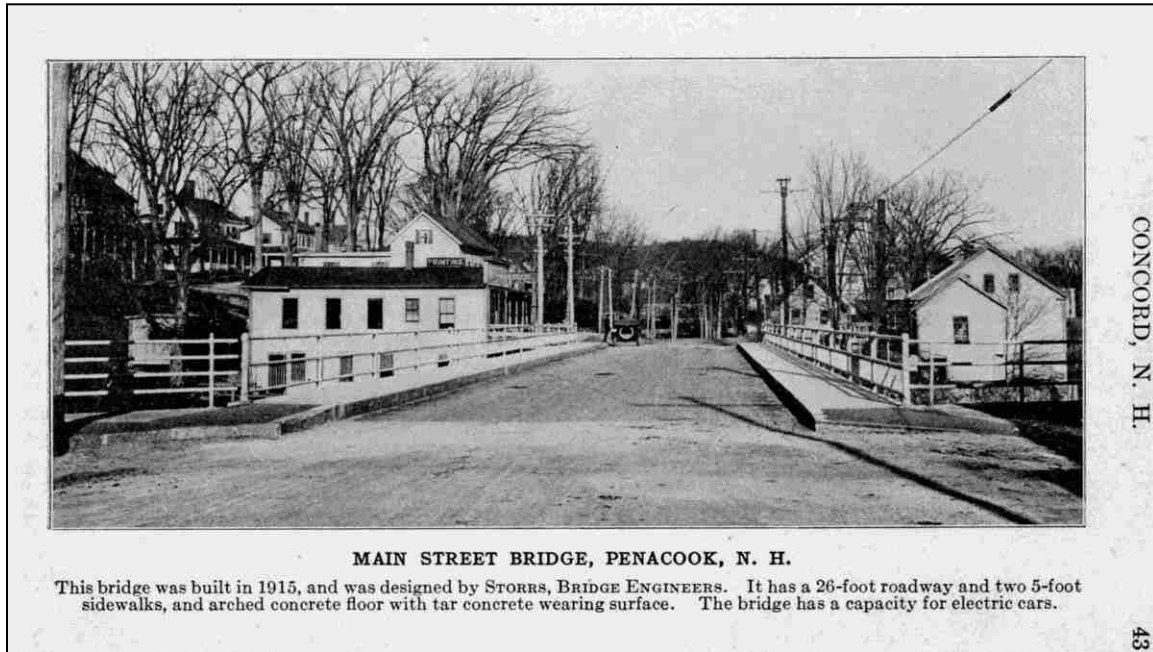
Main Street Bridge Penacook, 1915 (Storrs & Storrs 1918).
